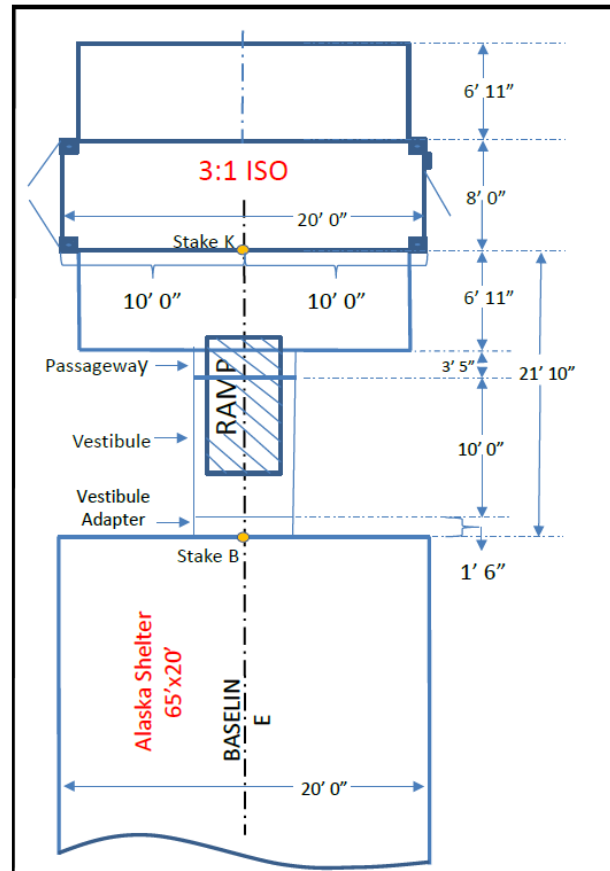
ISO 3:1 Side Panel to an Air Supported Shelter 65 ft. by 21 ft. endwall door
